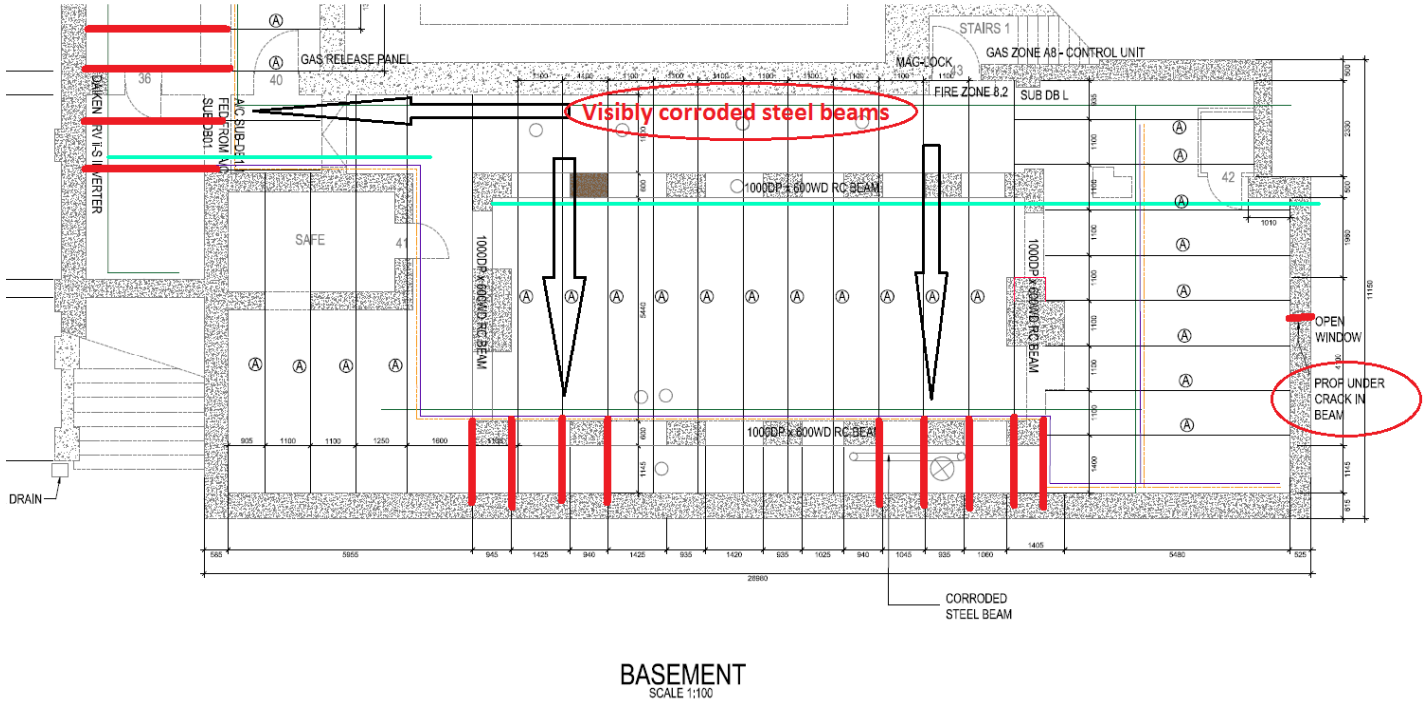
Location of severely corroded steel beams inside the concrete slab in the basement identified on site.
